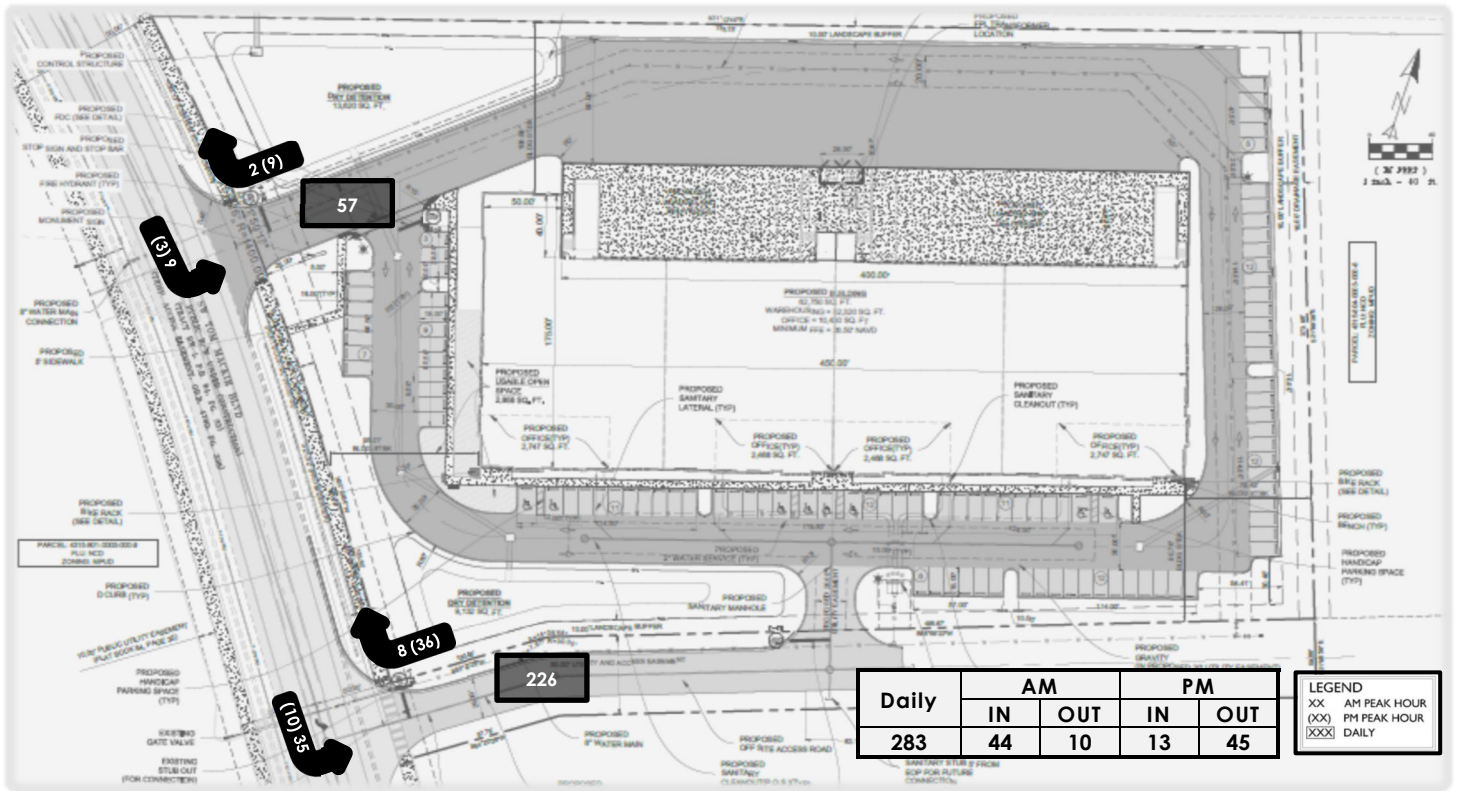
Project Driveway Volumes W/O Hegener Drive Extension to Village Pkwy
